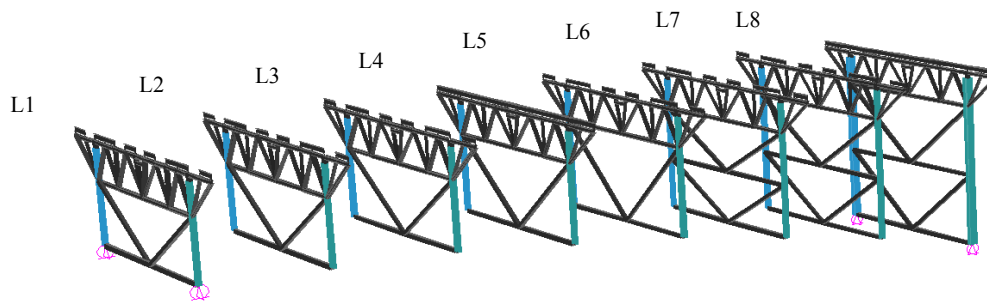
Portal, Sway Frame and Floor Truss between Panel Point L0–L8
